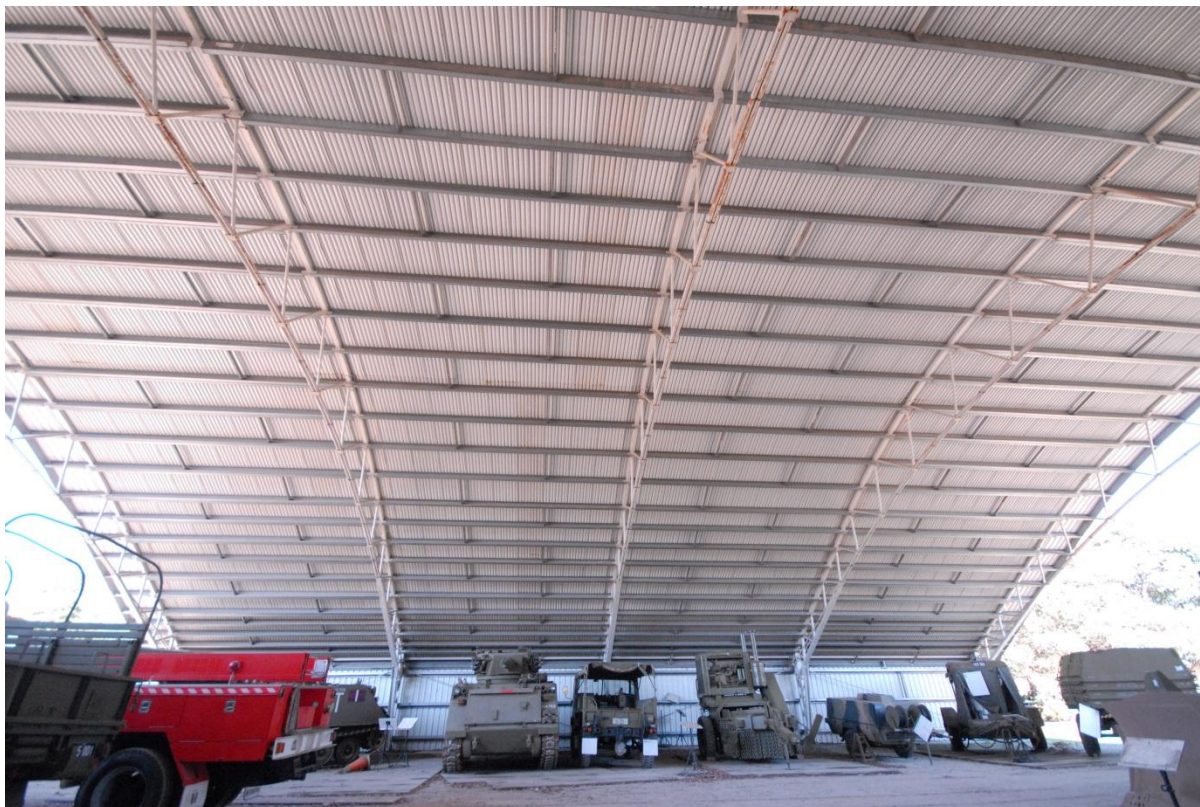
General interior view, looking SW, showing arch trusses, and columns, (image no. STRARCH 0028)
